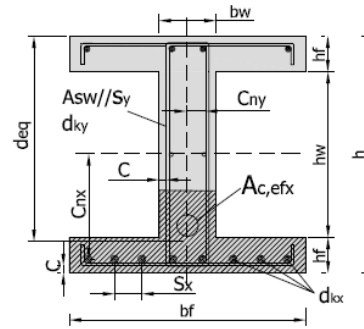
Geometrical parameters used to calculate the horizontal and vertical spacing
